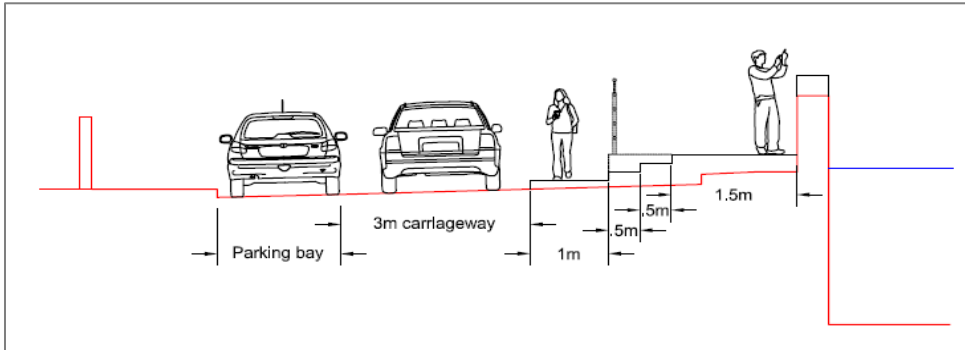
Typical section through the road, steps and wall at Sir Harry's Mall
